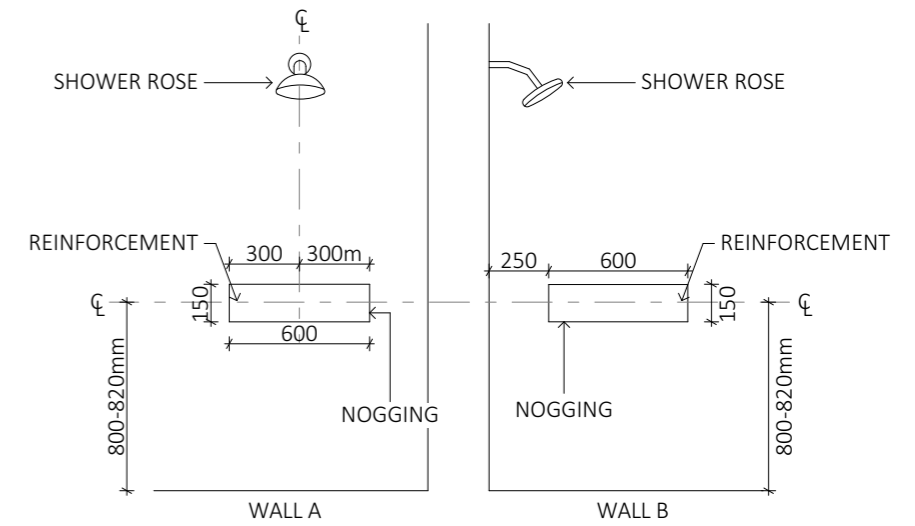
C - LOCATION OF NOGGINGS FOR SHOWER WALLS
